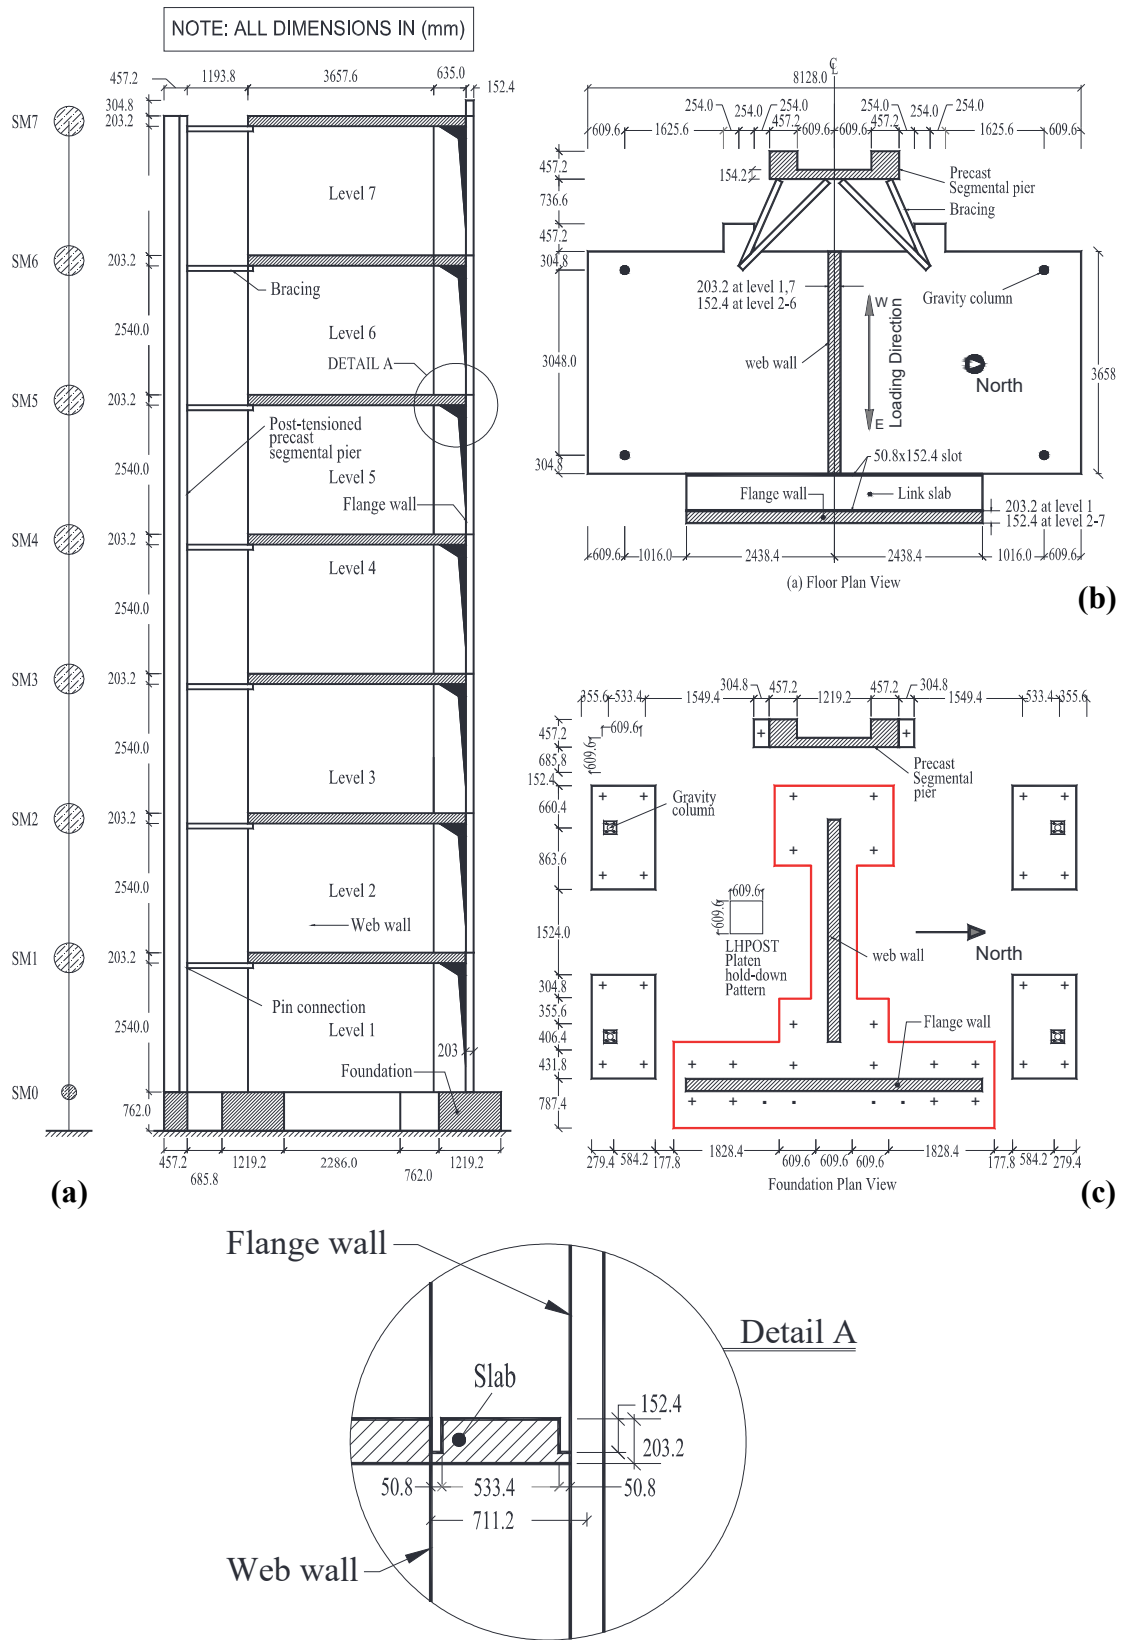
Test structure used in modelling verification: (a) Elevation; (b) Floor plan view; and (c) Foundation plan view
